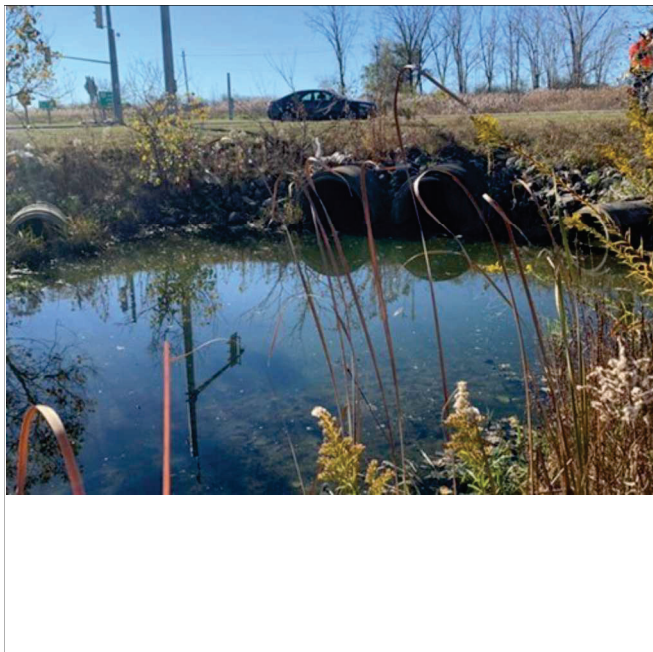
Watercourse Crossing 1 inlets into four (4) concrete culverts north of CR 46, east of the 401 overpass.
